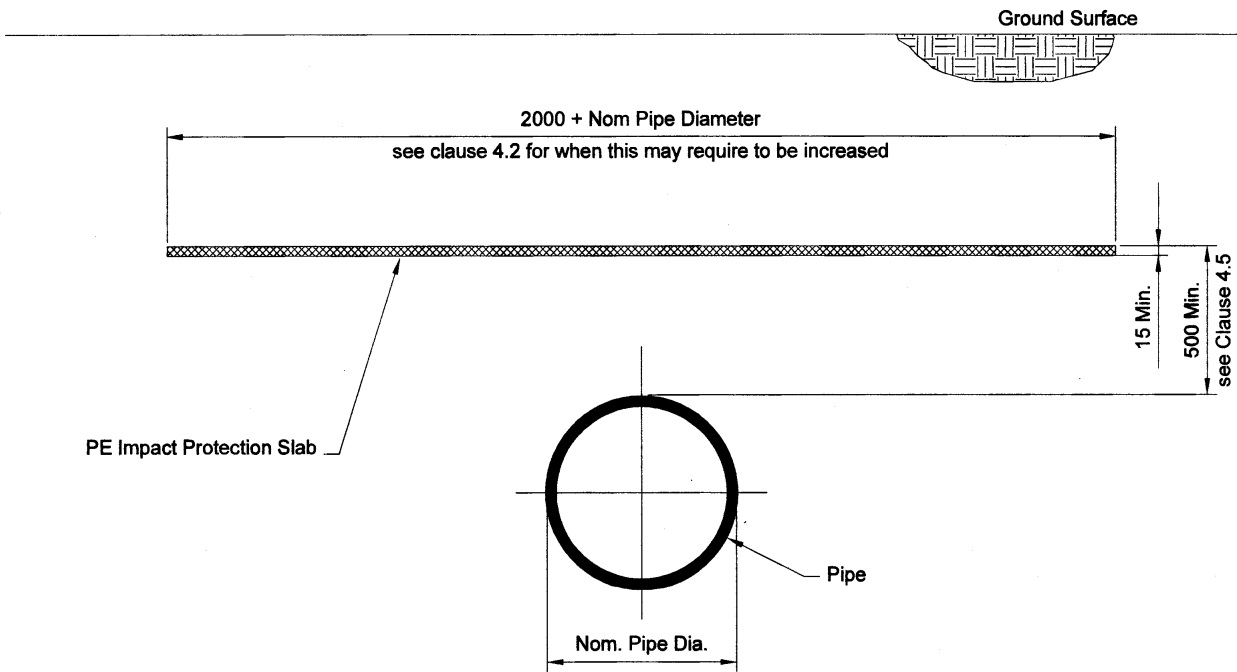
Standard PE Impact Protection Slab (Dimensions in mm)
